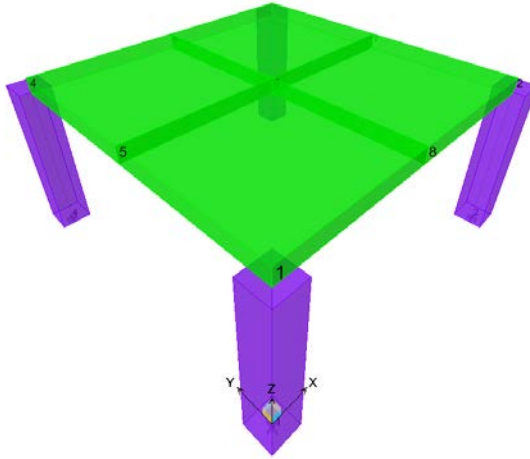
3D View of a Single-Story Structure Modelled with a Slab (SAP2000-Model 1)
